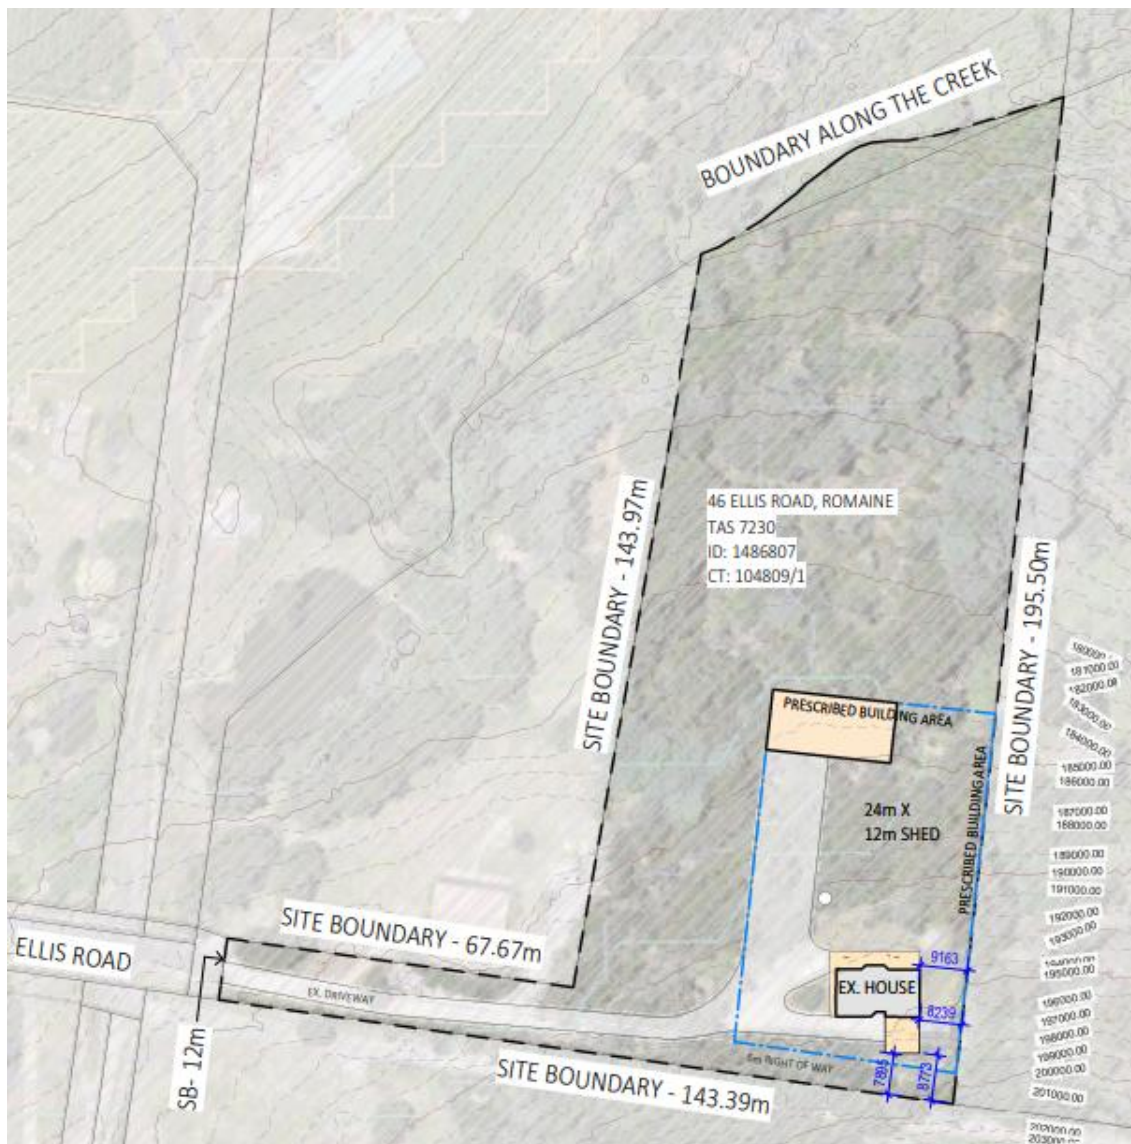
Proposed site plan showing title boundary, building envelope, existing house and proposed development. Source: S Group
